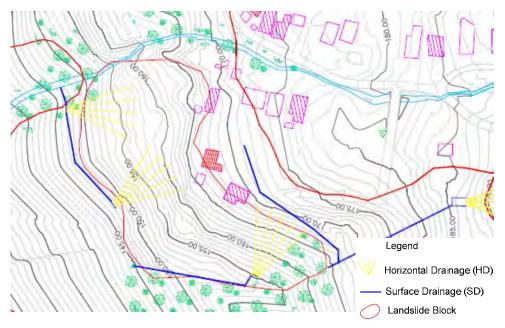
Plan of Countermeasure Works in Block B (source: JET)
